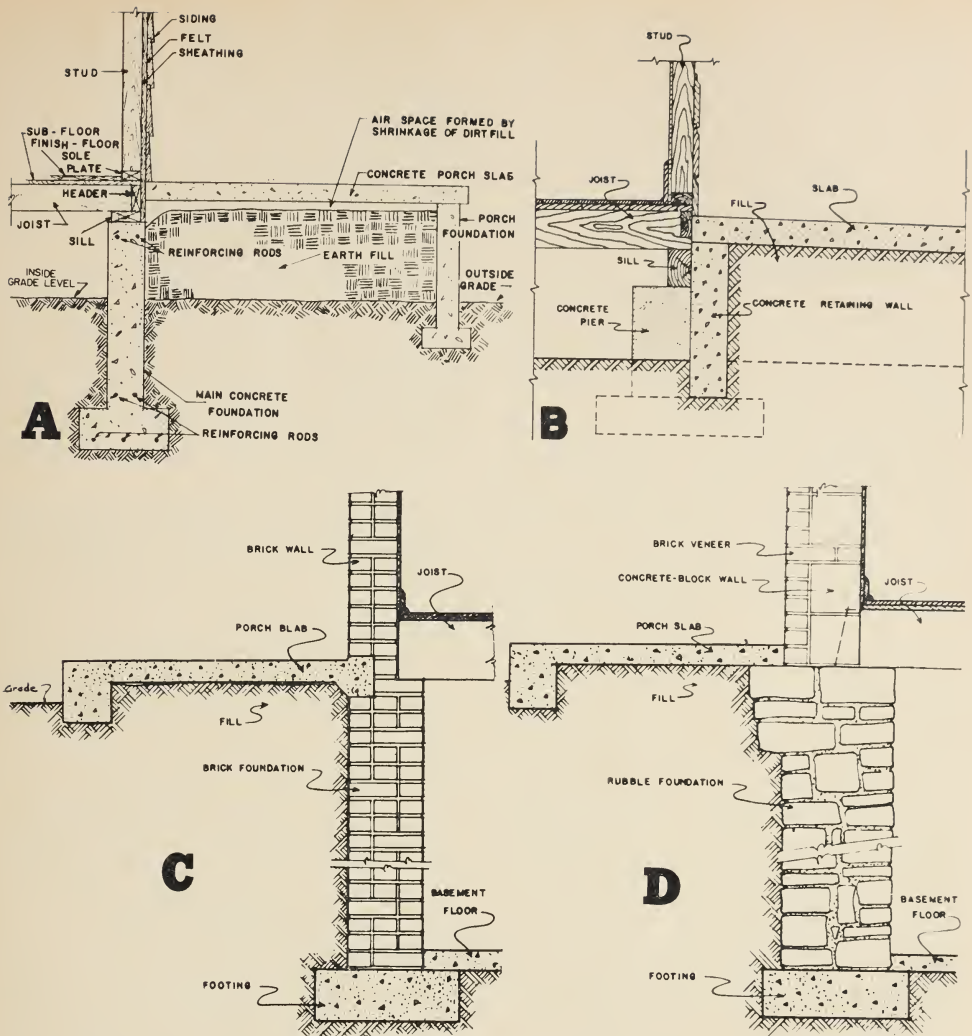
Types of construction: A. earth-filled concrete porch on frame house; B. earth-filled porch with concrete retaining walls against concrete piers of frame house; C. slab on fill against brick foundation, brick house; D. slab on fill against rubble foundation, concrete-block wall, brick veneer. (From Heal, 1951.)
